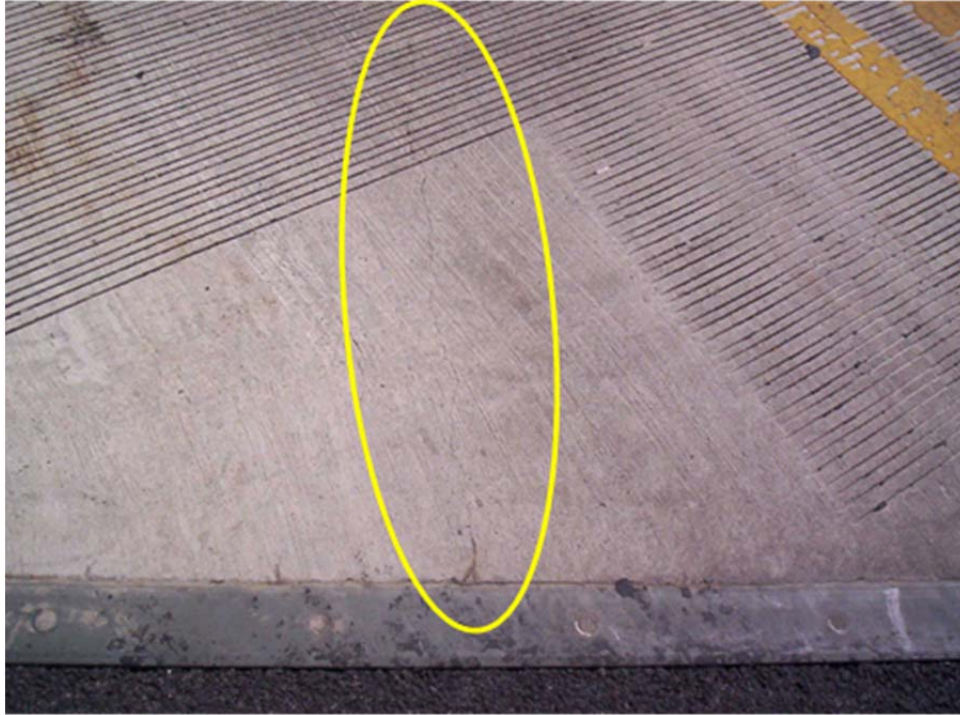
Longitudinal Crack on the Top Surface of the Knoxville, MD, Bridge
